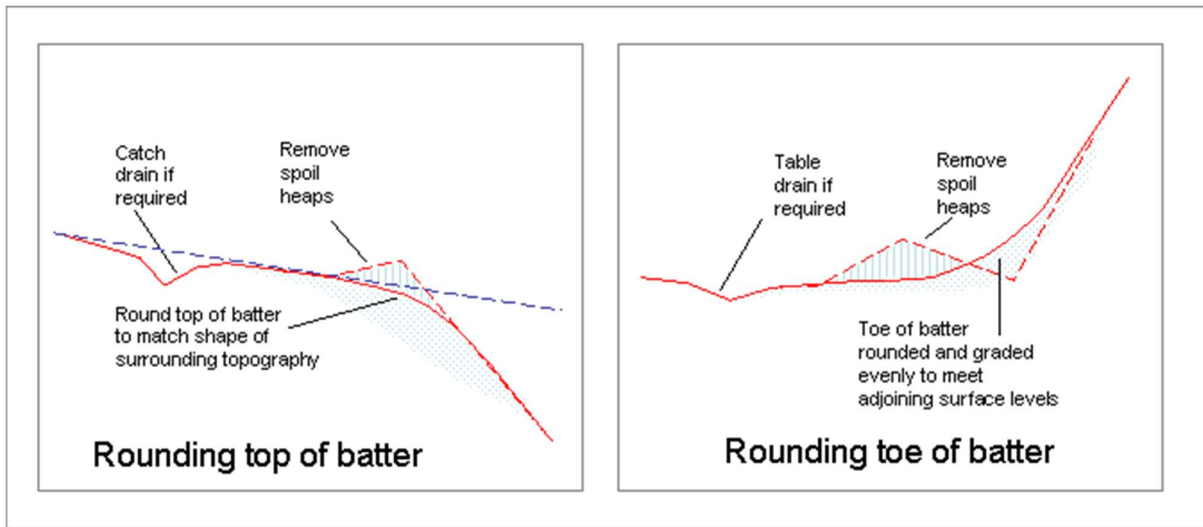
Typical Cross Section for Rounding of Top and Toe of Batter Slopes
